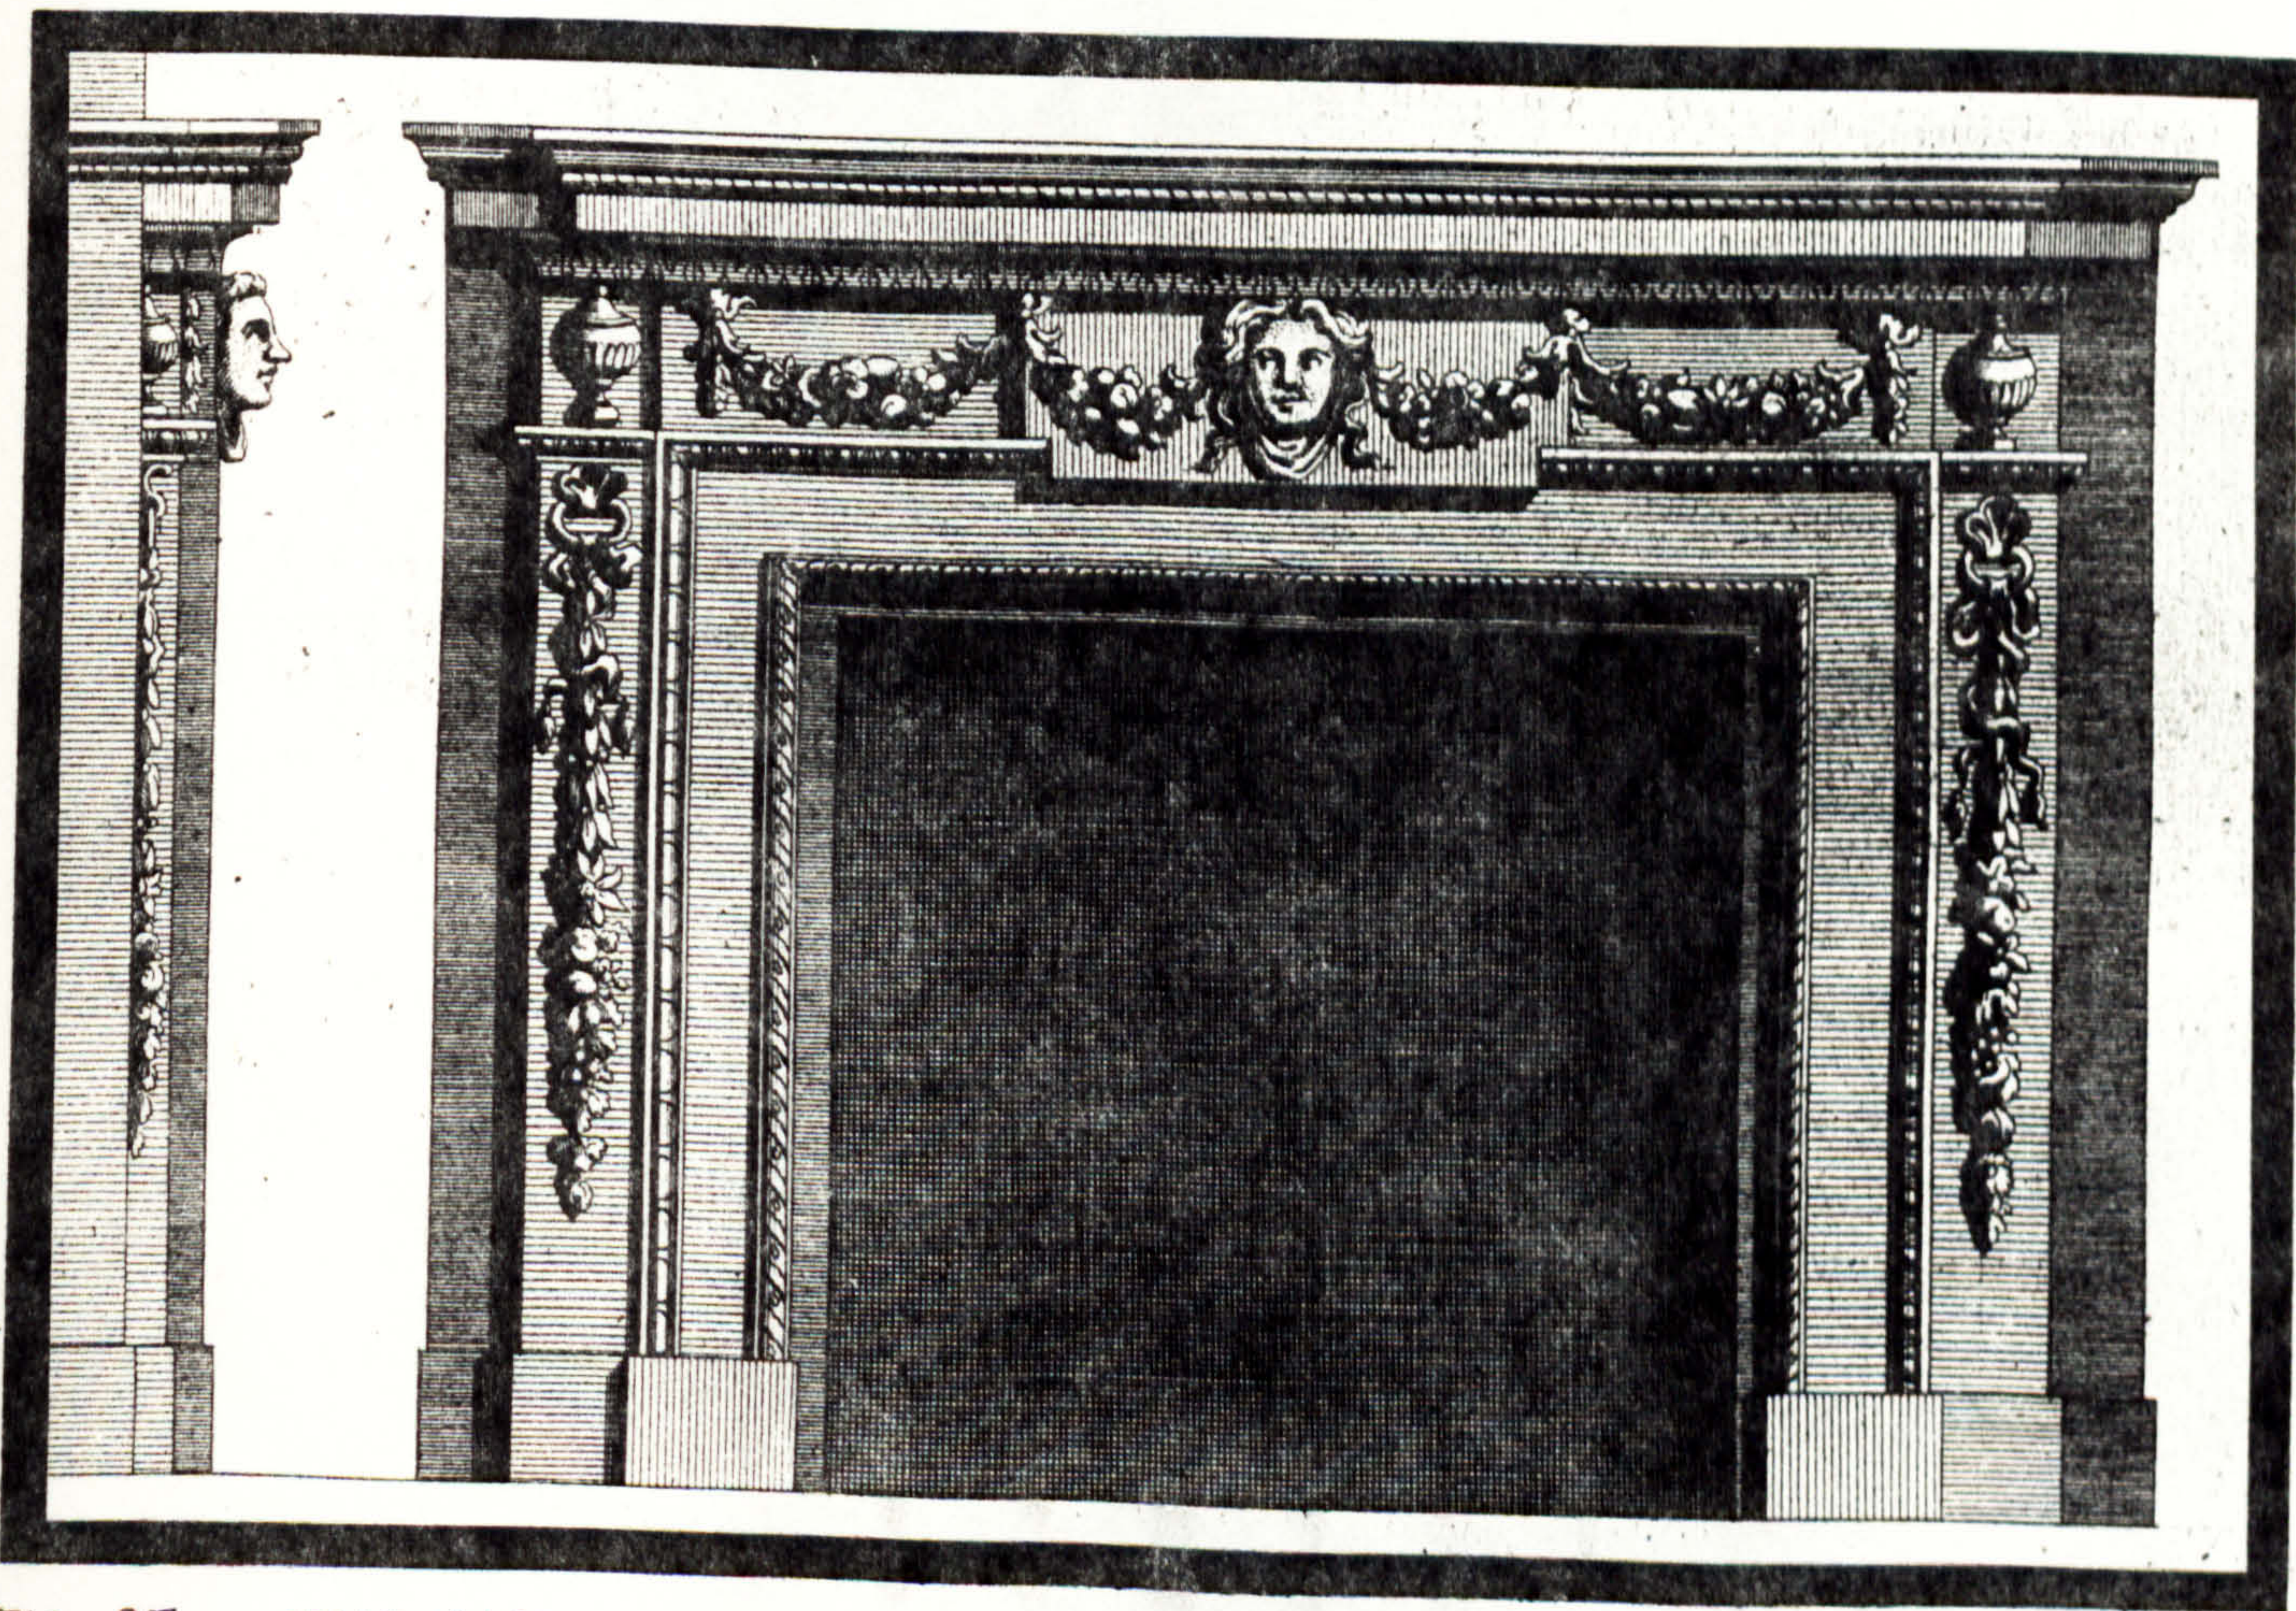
ISAAC WARE · DESIGN FOR CHIMNEYPIECE
